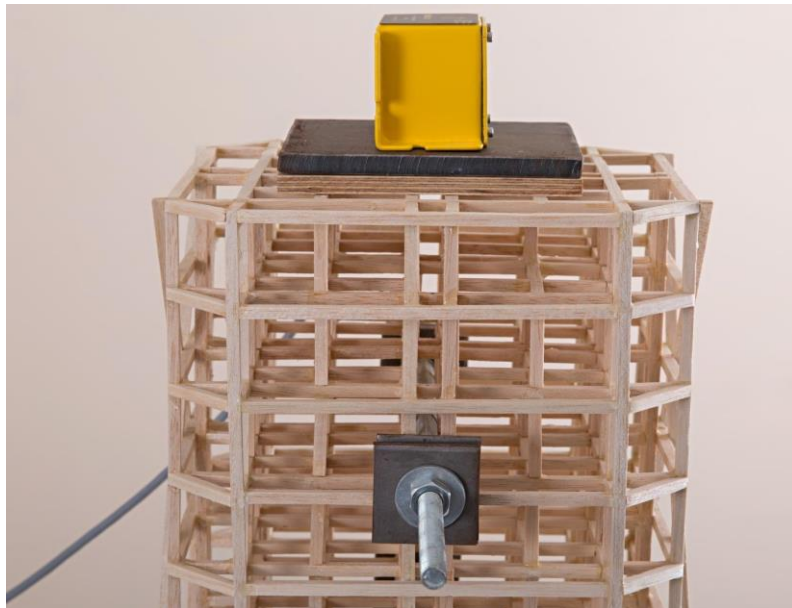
Roof Weight Components (Wooden Plate, Metal Plate, and Accelerometer)
